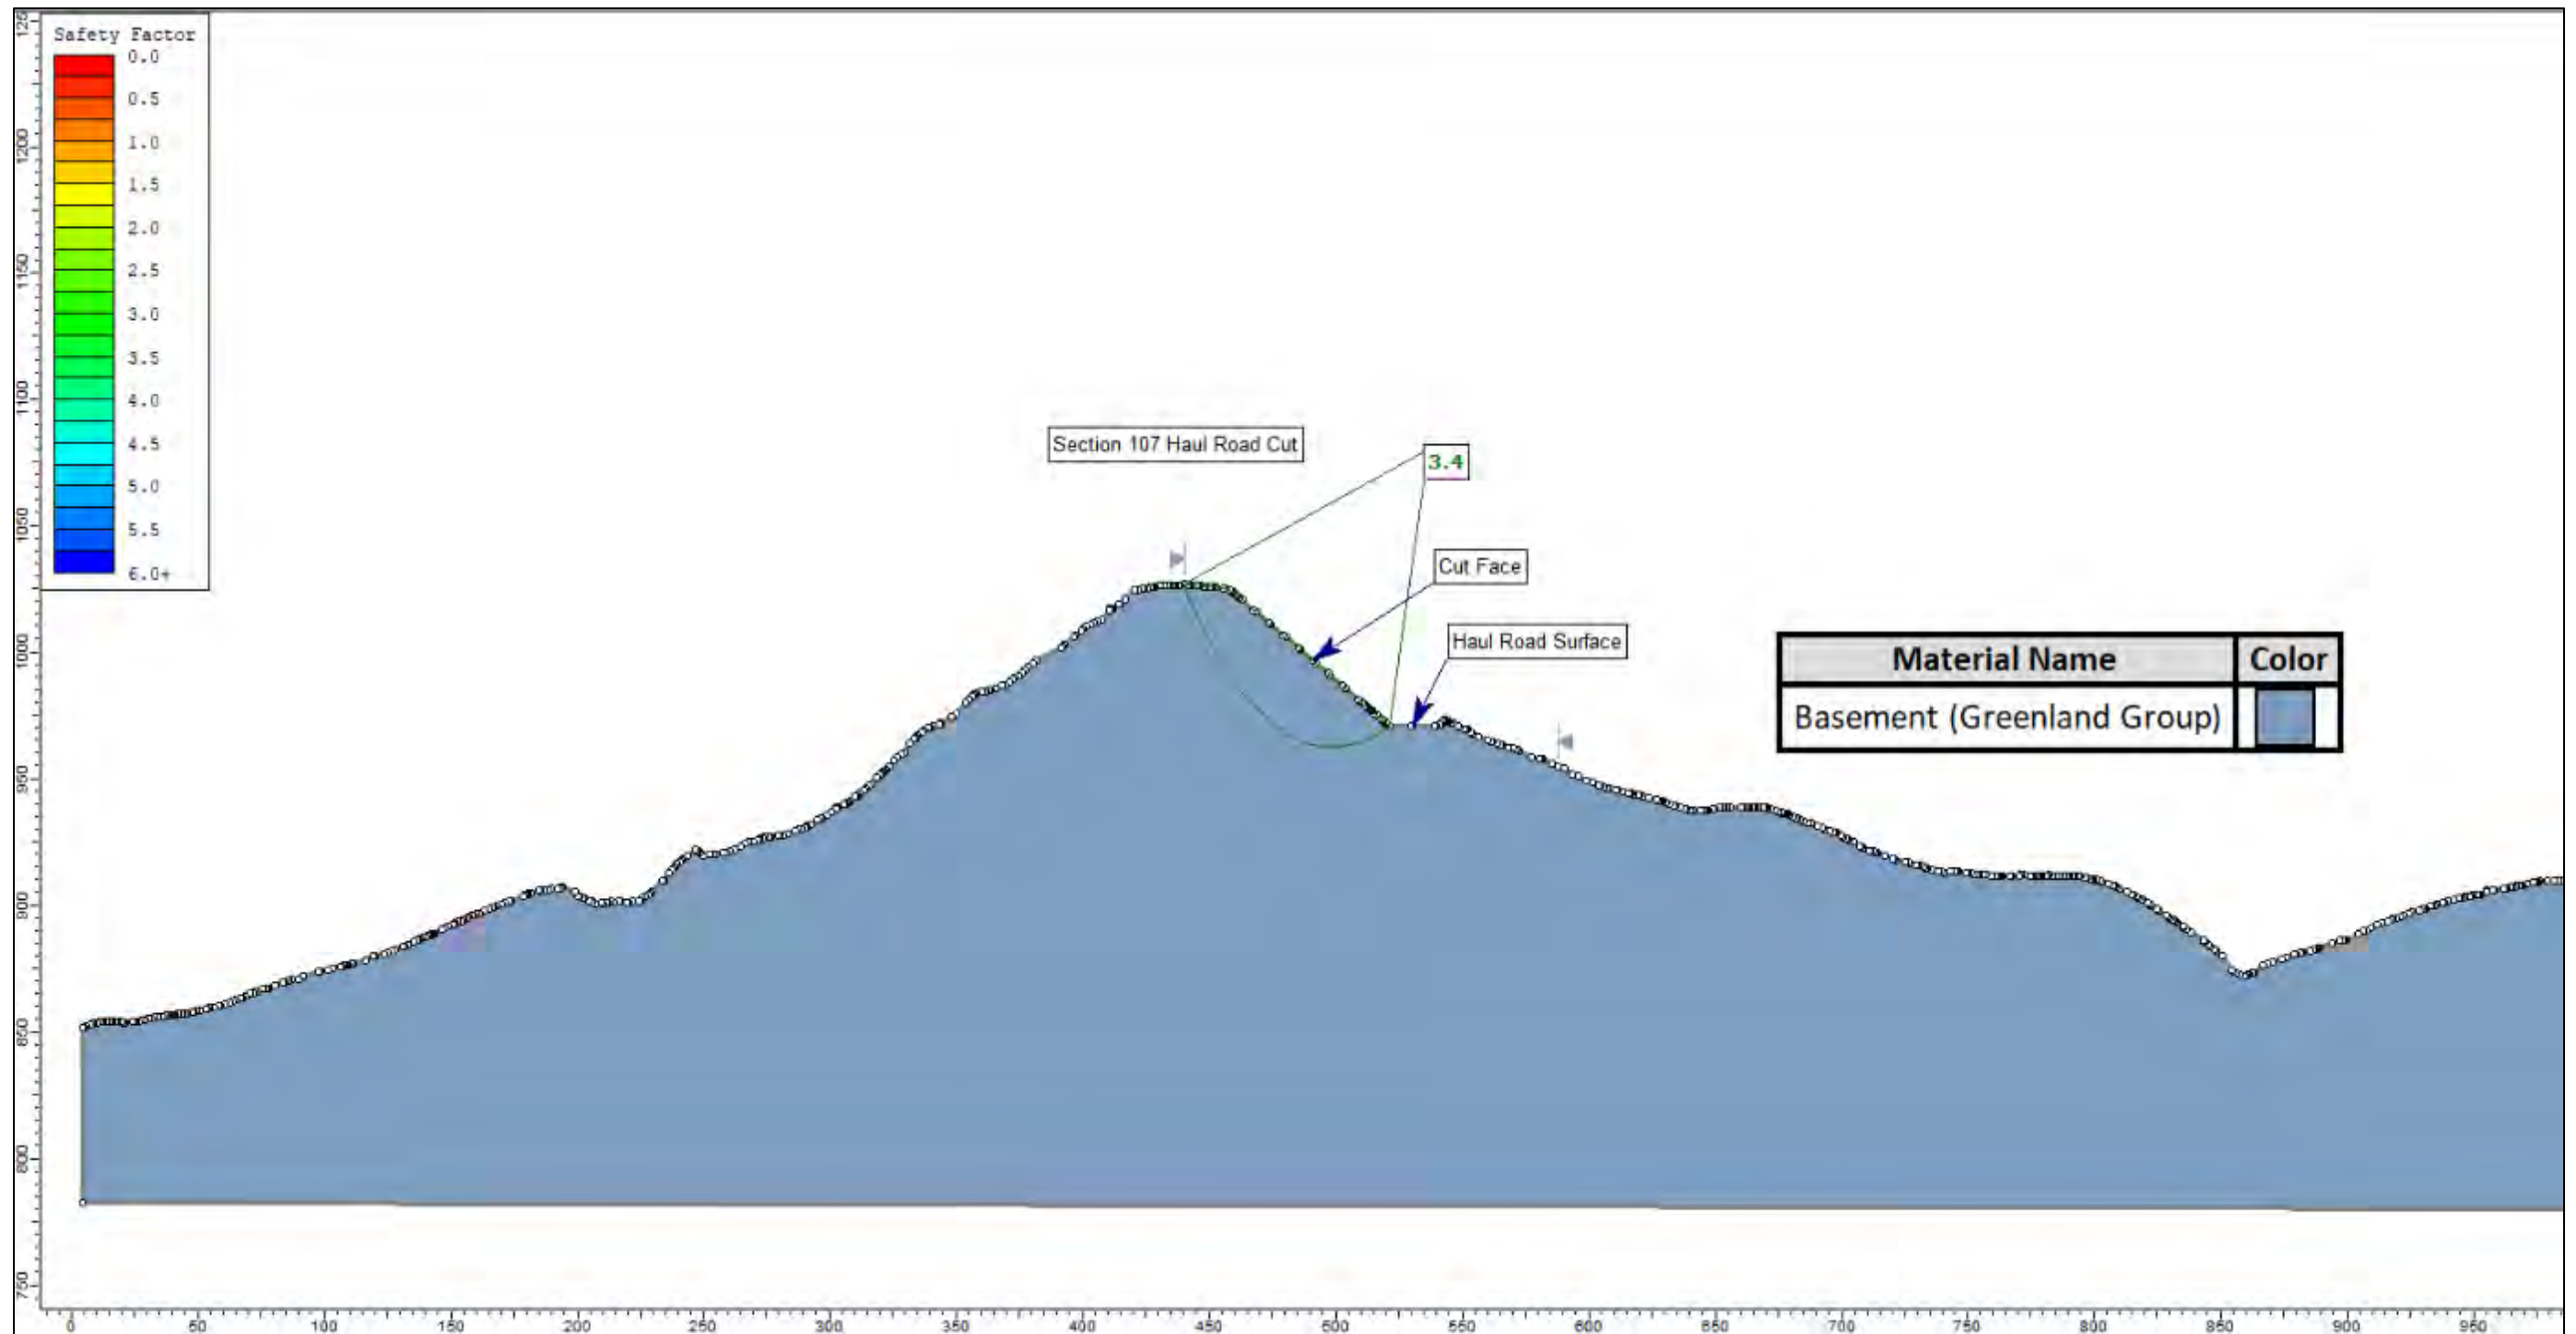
Haul Road Cut - Section 107 – Static Conditions.
